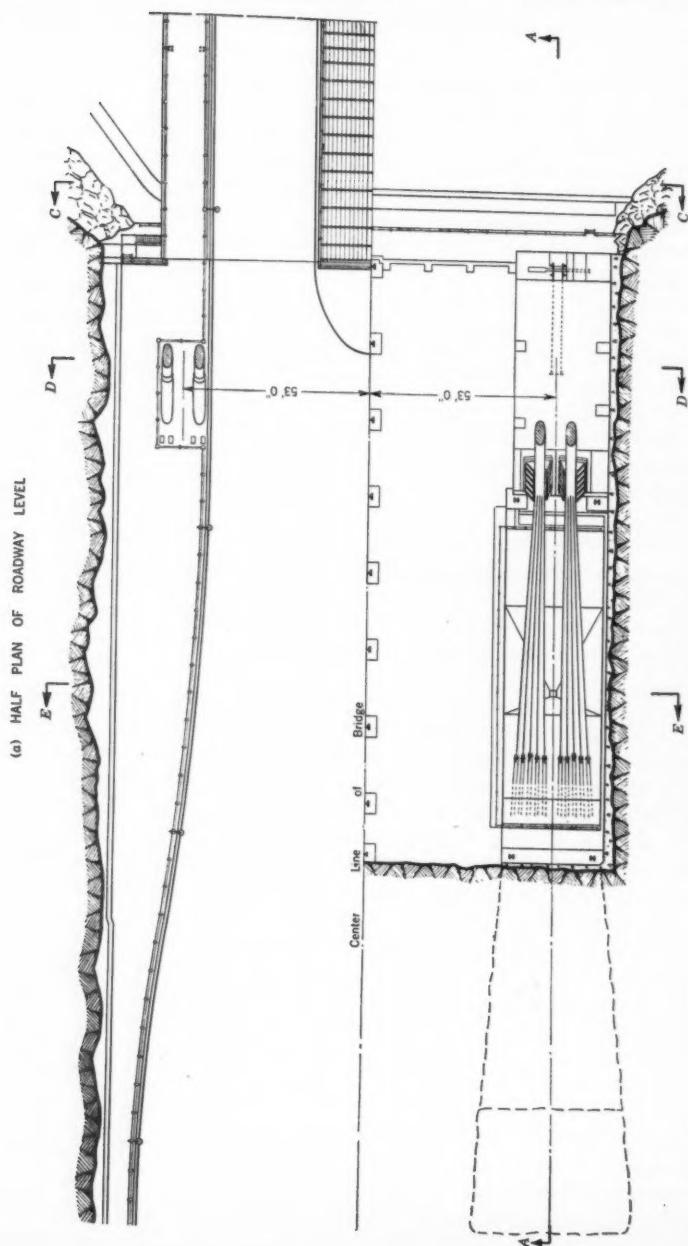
(a) HALF PLAN OF ROADWAY LEVEL
